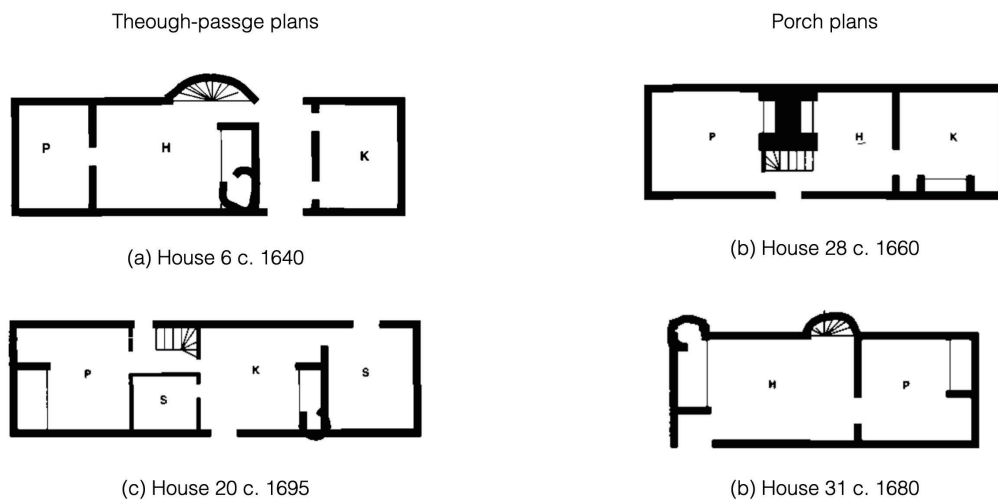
Wood-Jones' plan typology for the Banbury region in which plan (a) and (c) are classified as through passage plans and (b) and (d) as porch plans (H=hall, P=parlour, K=kitchen, S=service area)
